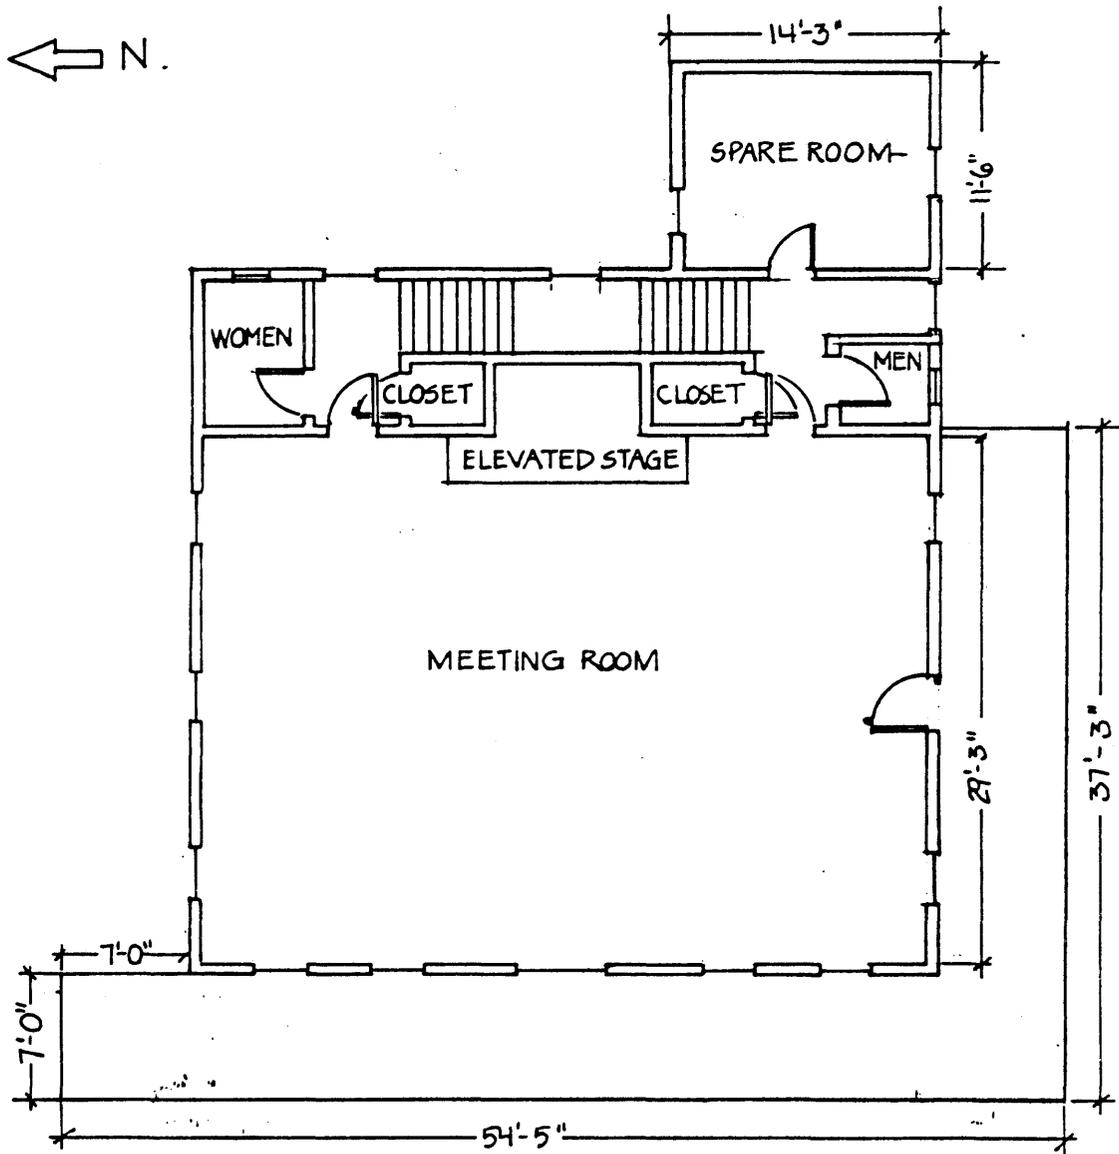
Floorplan of the upstairs, Lemon Cove Woman's Clubhouse.
